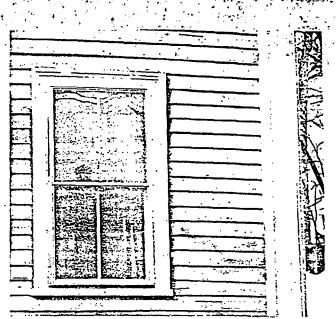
The addition of triple track starm windows, as shown here, greatly improves the thermal performance of existing window assemblies, with a minimal impact on the appearance of the building. (Photo: Baird Smith)
